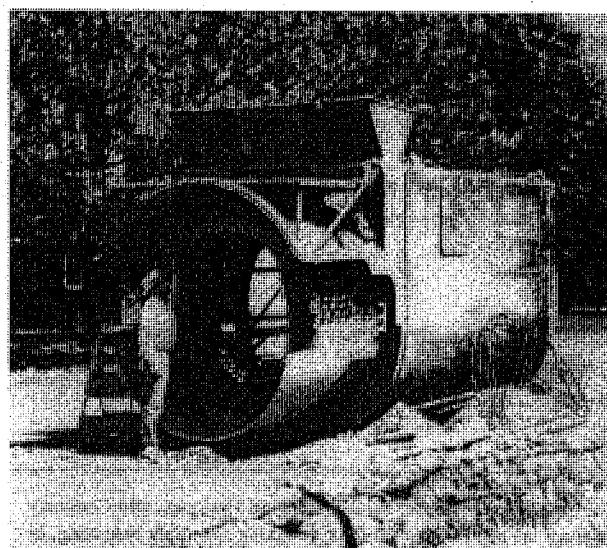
Single-stage construction using metal forms. Rear view of 84 in. (2135 mm) single-stage machine. Six ft (1.8 m) long aluminum forms are fed into machine over rollers attached to the mandrel. Metal arch spreaders, used to support the forms, are shown leaning against the machine.
